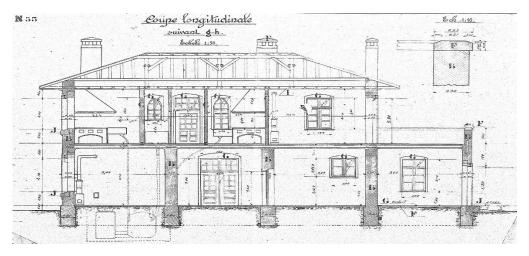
Project drawn for Fevzipaşa / Longitudinal section
